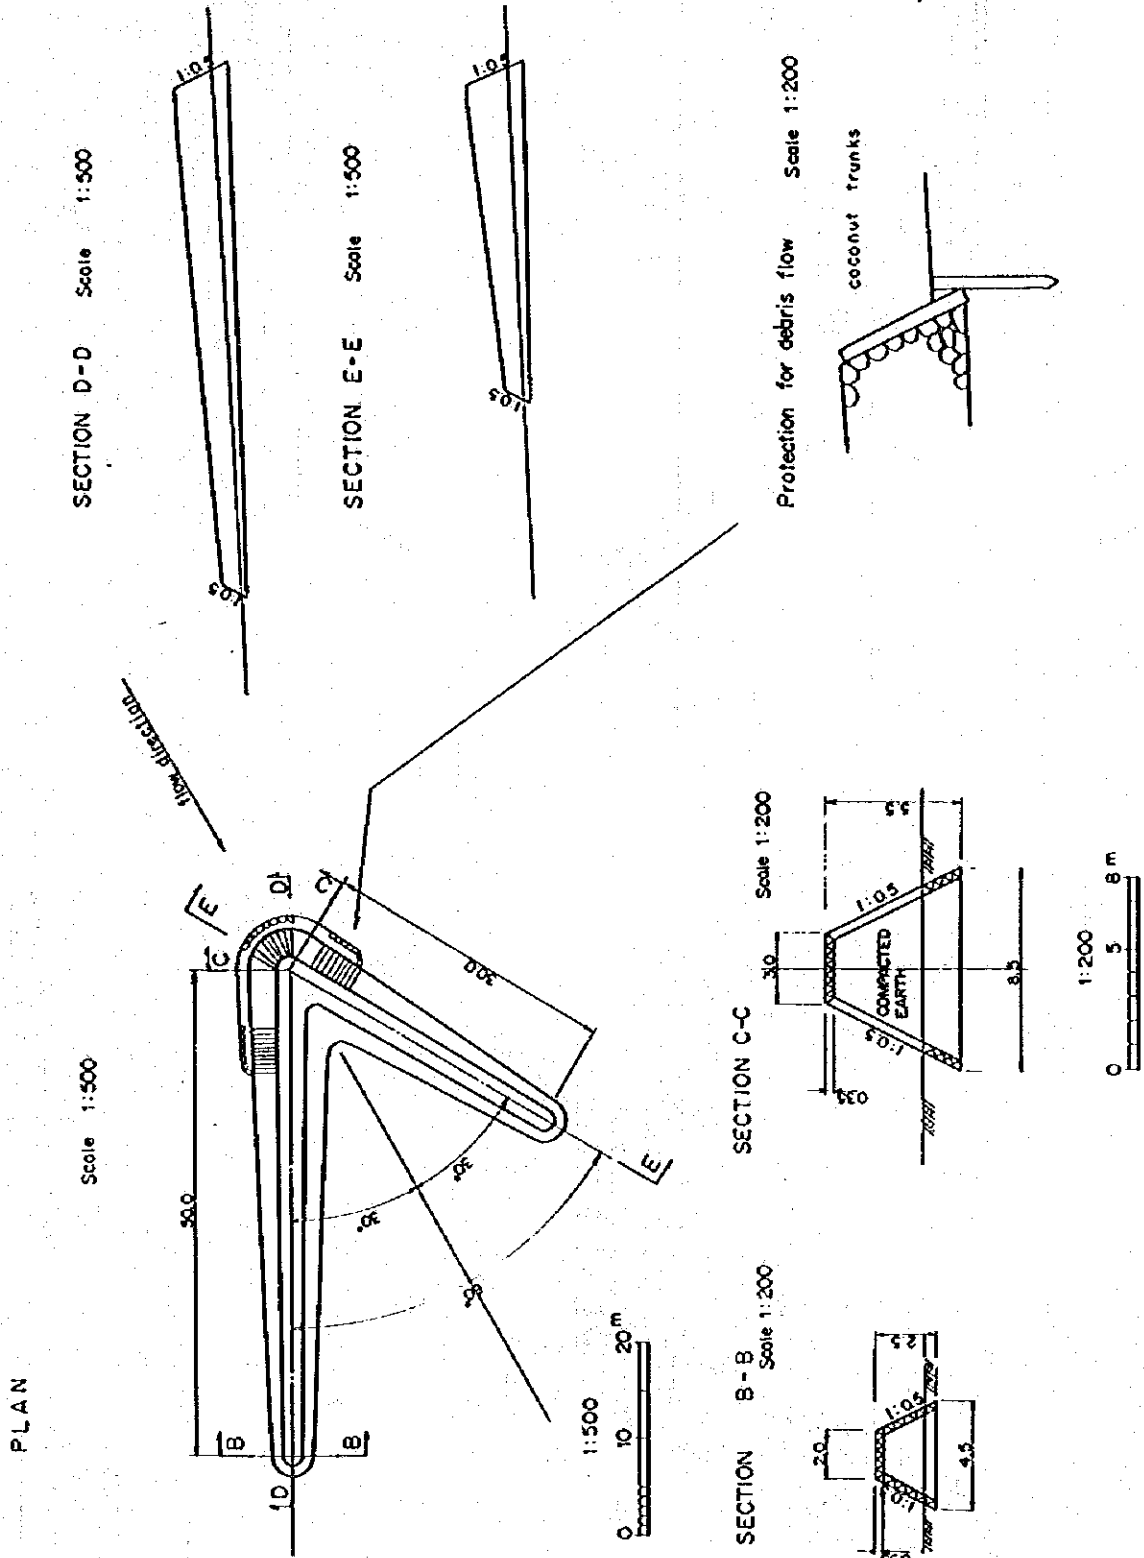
TYPICAL DESIGN OF GROUND SILL (TYPE A)
